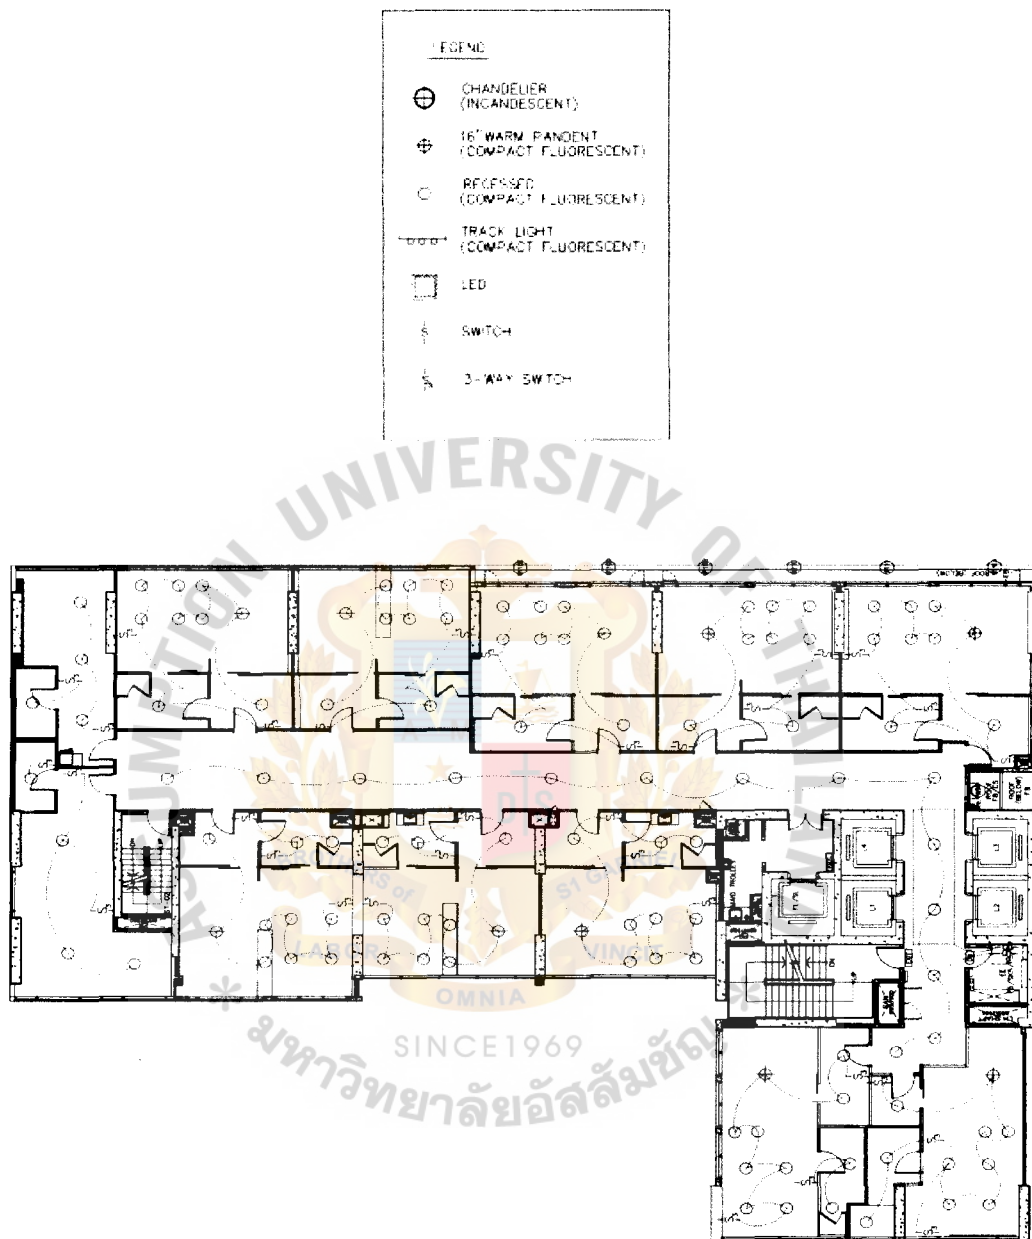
Reflected Ceiling and Lighting Plan of 7th - 25th floor plan
